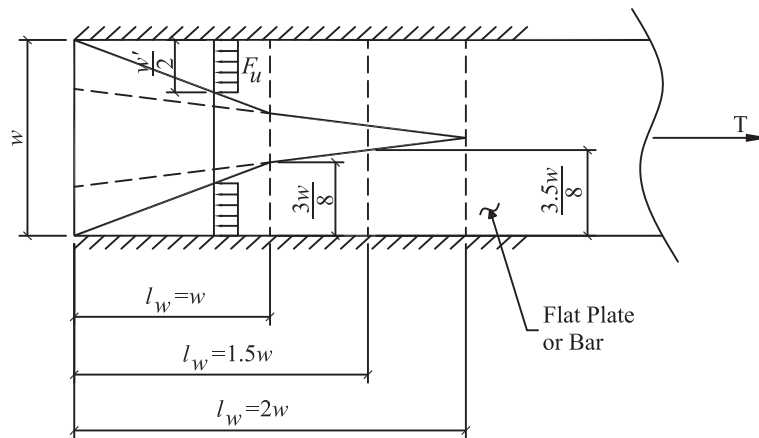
Representation of CSA shear lag model for welded flat-plate tension members.
